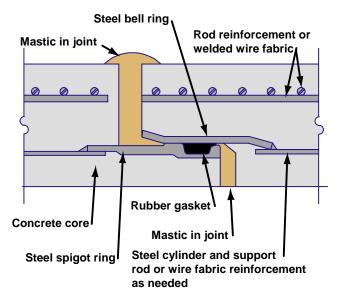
Reinforced concrete cylinder pipe (RCCP) details.
